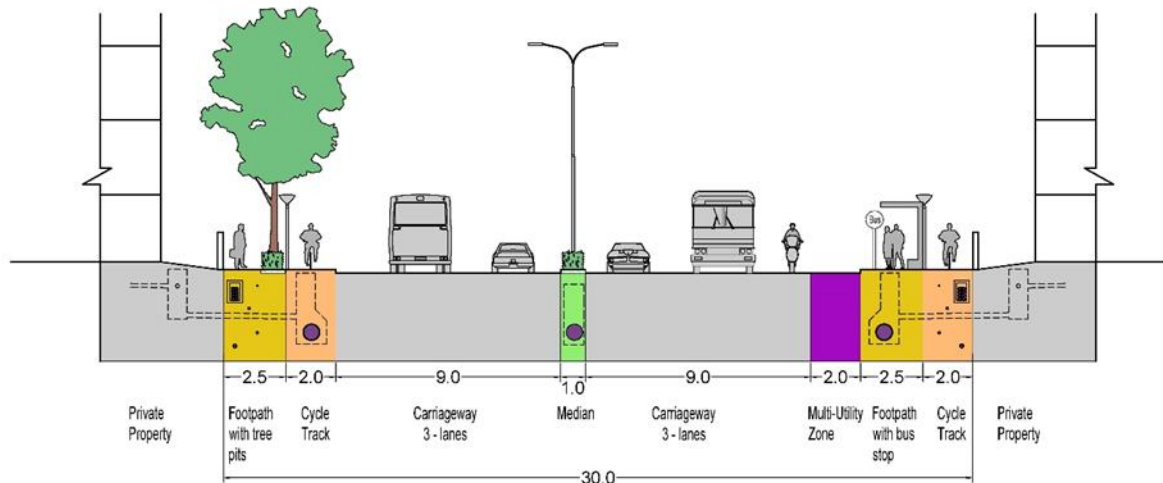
TYPICAL SECTION OF 30M WIDE ROAD
